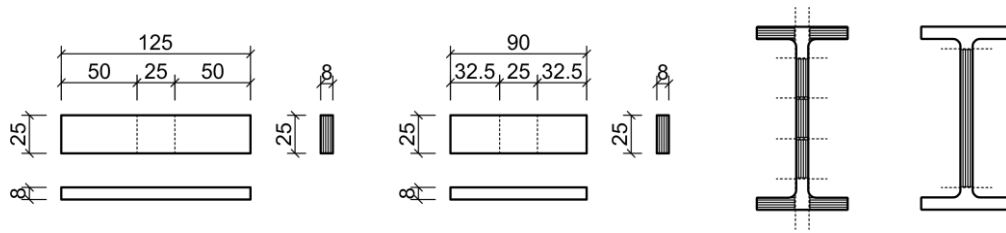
Lengthwise and crosswise coupon nominal dimensions and sampling areas for in-plane compressive tests (mm).
